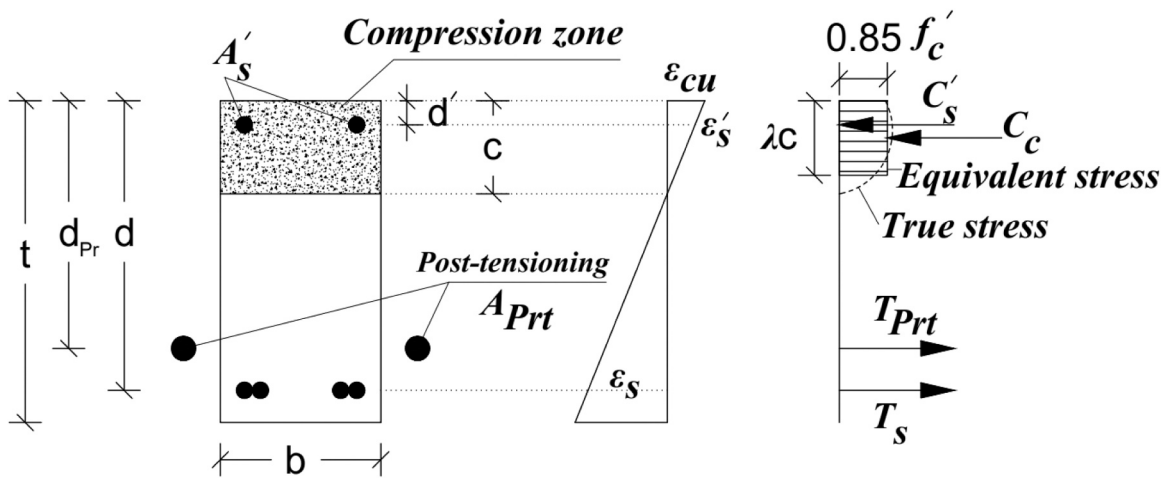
Cross-section of a beam strengthened using post-tensioned bars.
